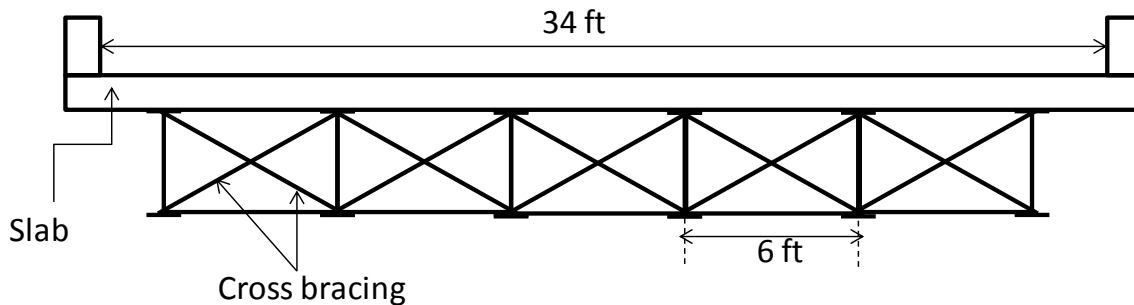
Cross section of the bridge slab, girders, and cross bracings.
